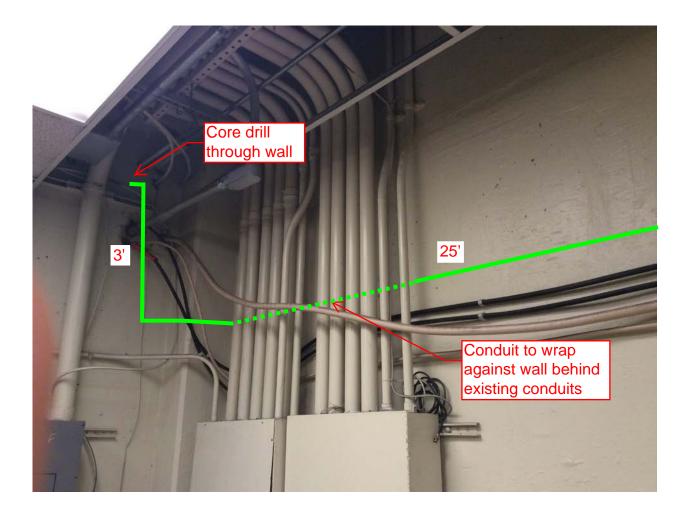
Proposed conduit run along wall inside Mechanical Room 214
